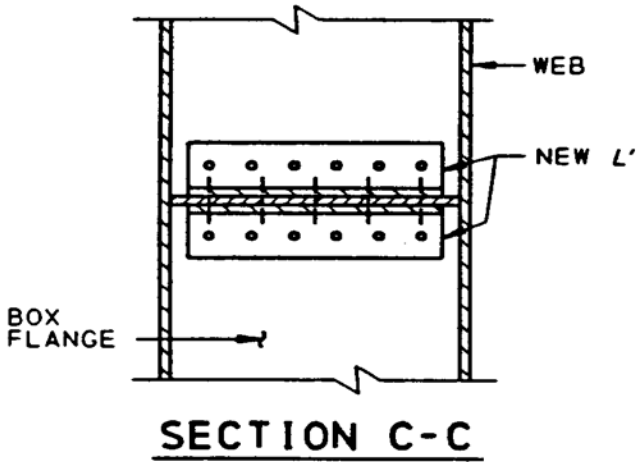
Fracture-Critical Girder Pier Caps
